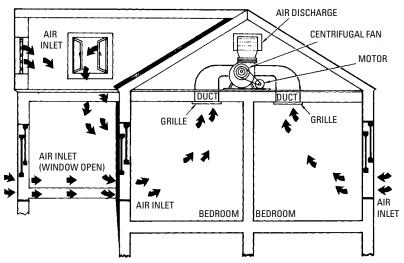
Multiblade centrifugal attic fan connected to exhaust ducts.
